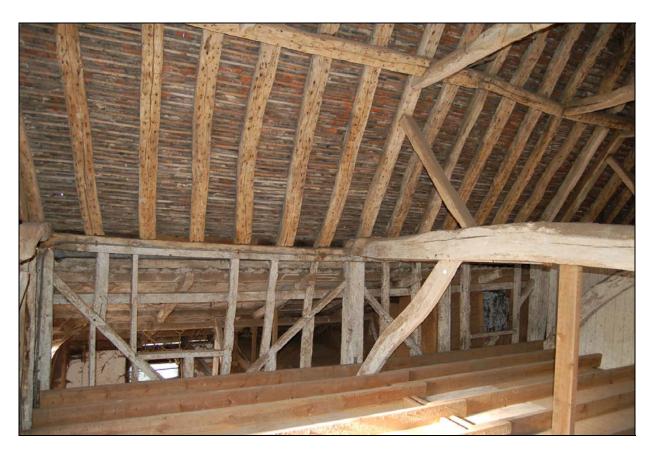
Openings on bays 4 & 5 south-west wall of Barn
